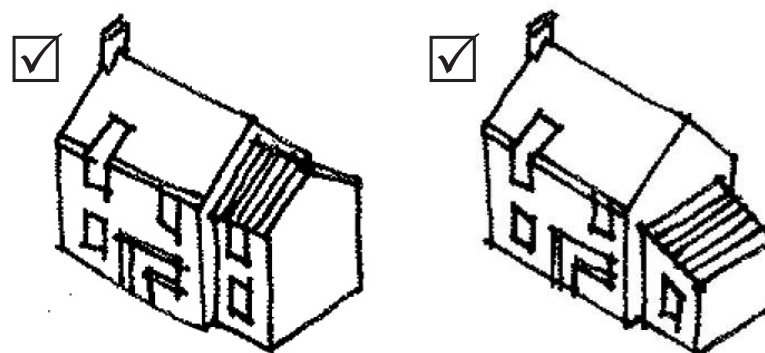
Extensions subservient to original dwelling with sympathetic roof and window details
